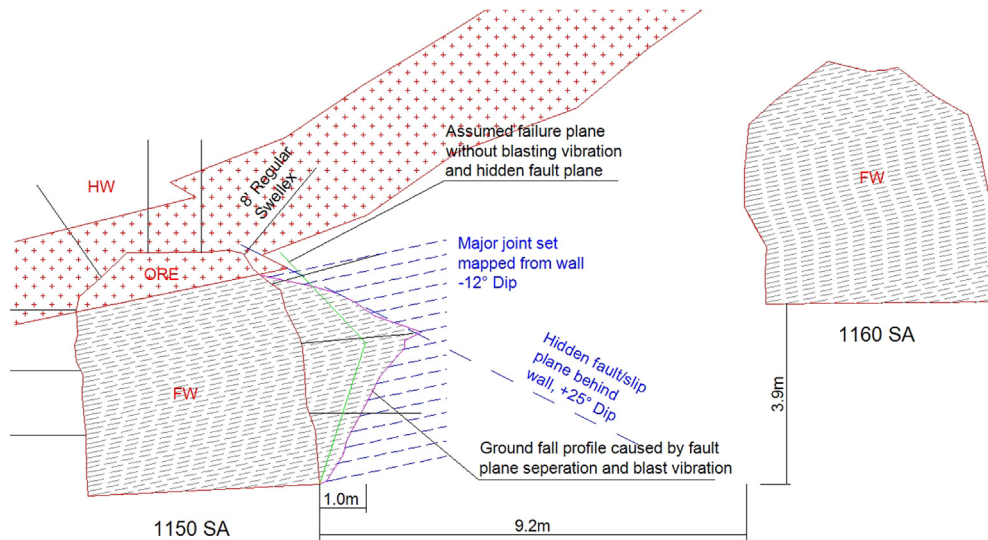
Cross-section of 1150 wedge failure depicting geology, ground support and proximity to 1160WV level (Shin, 2014b). HW and FW stand for hanging wall and footwall, respectively.
